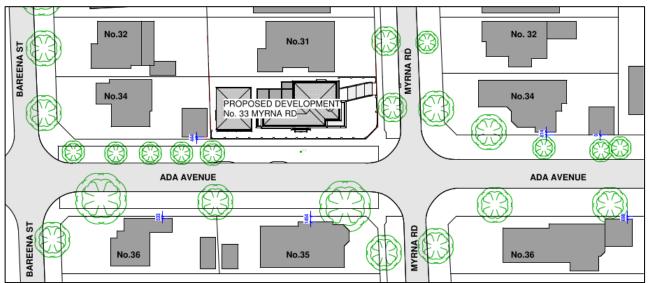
Site plan of the proposed development and surrounding locality. Note outbuildings and detached garages with minimal setbacks at No. 34 and 36 Bareena St and No. 34, 35 and 36 Myrna Road.
